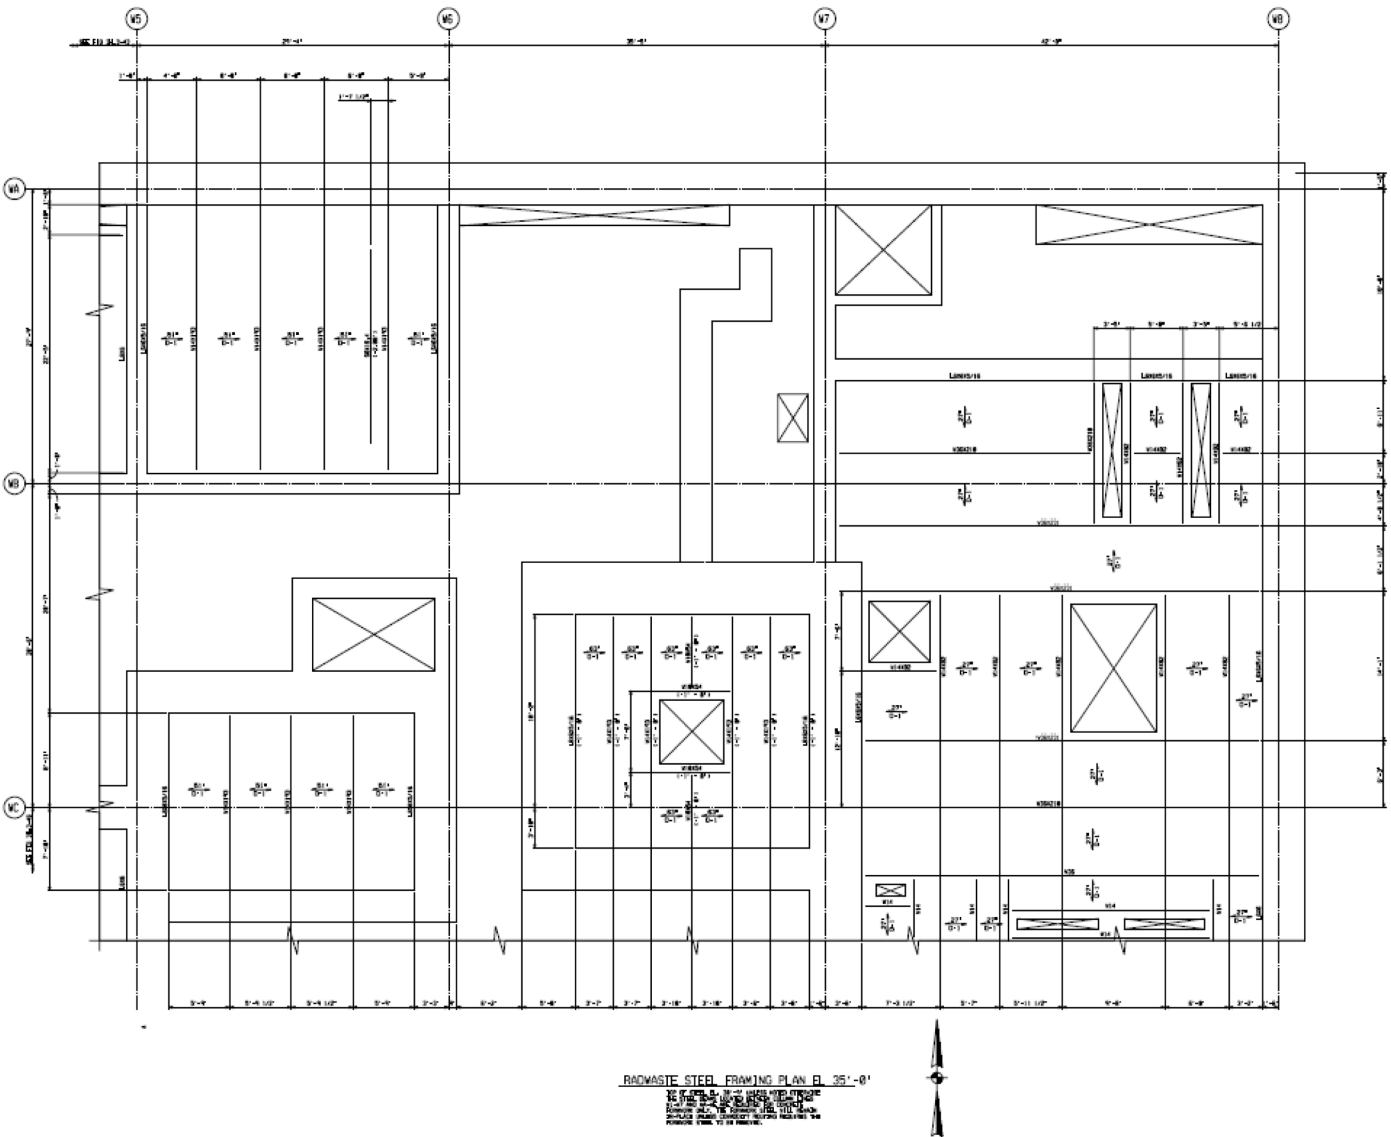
H.3-44 RWB EI 35'-0" Steel Layout Between Column Lines W5-W8 and WA-WC
